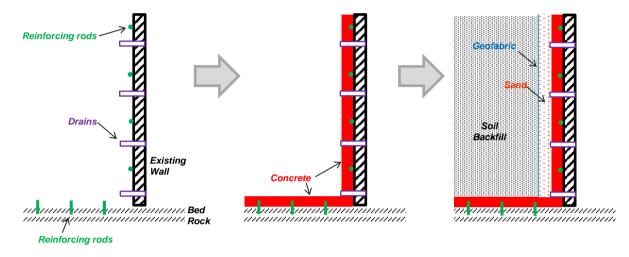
Illustration of Proposed reinforcement of portions of Salt Rock sea wall (adapted form Bosch Stemele, 2017)
